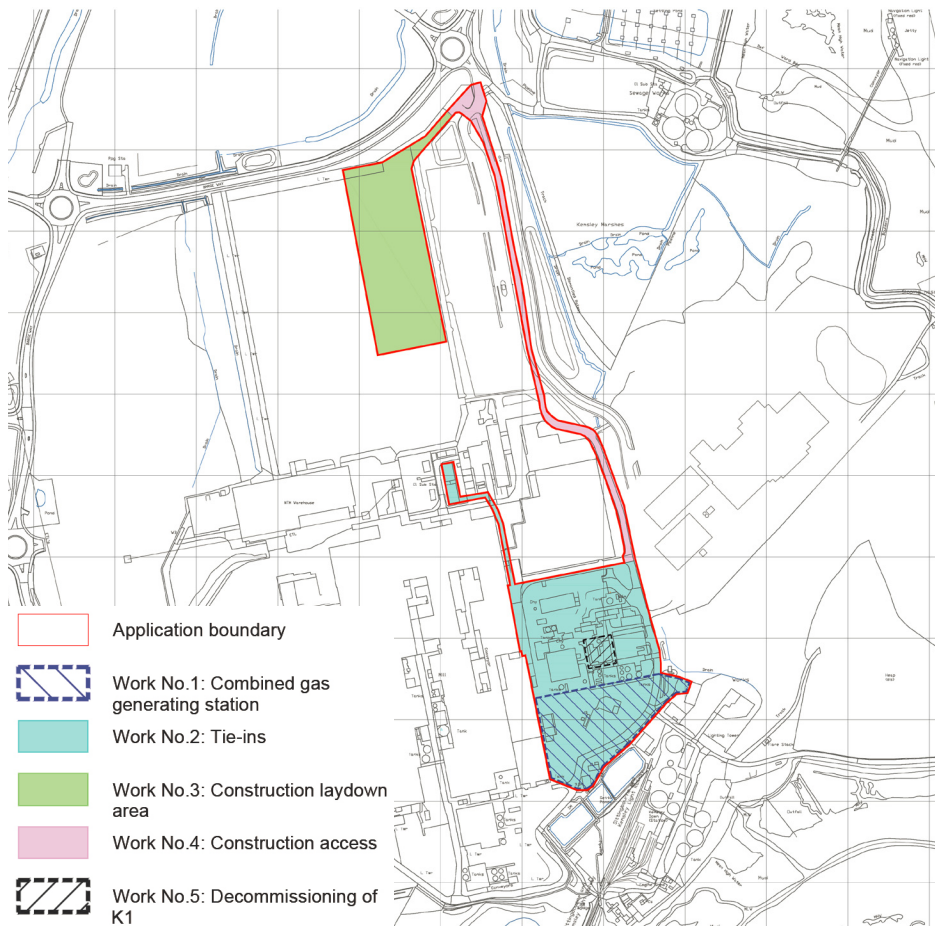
Document 4.4 - Works Plans - Key Plan
